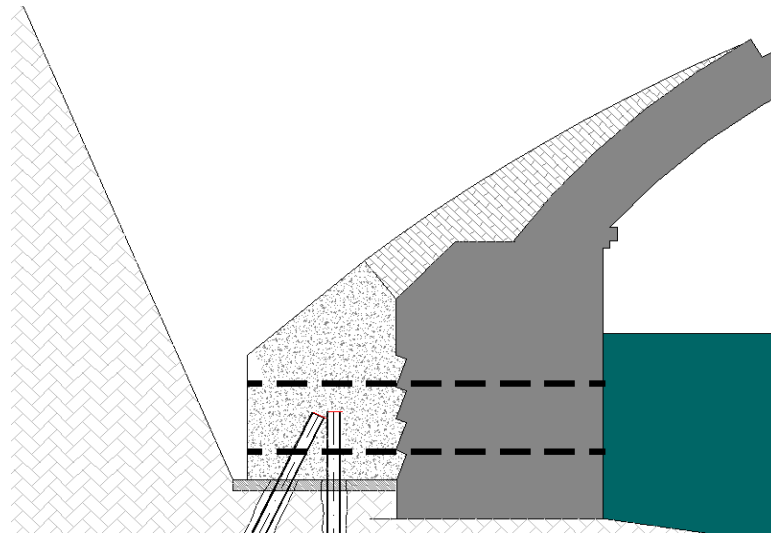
Addition of new masonry arch layer. (Modena, 2004)
